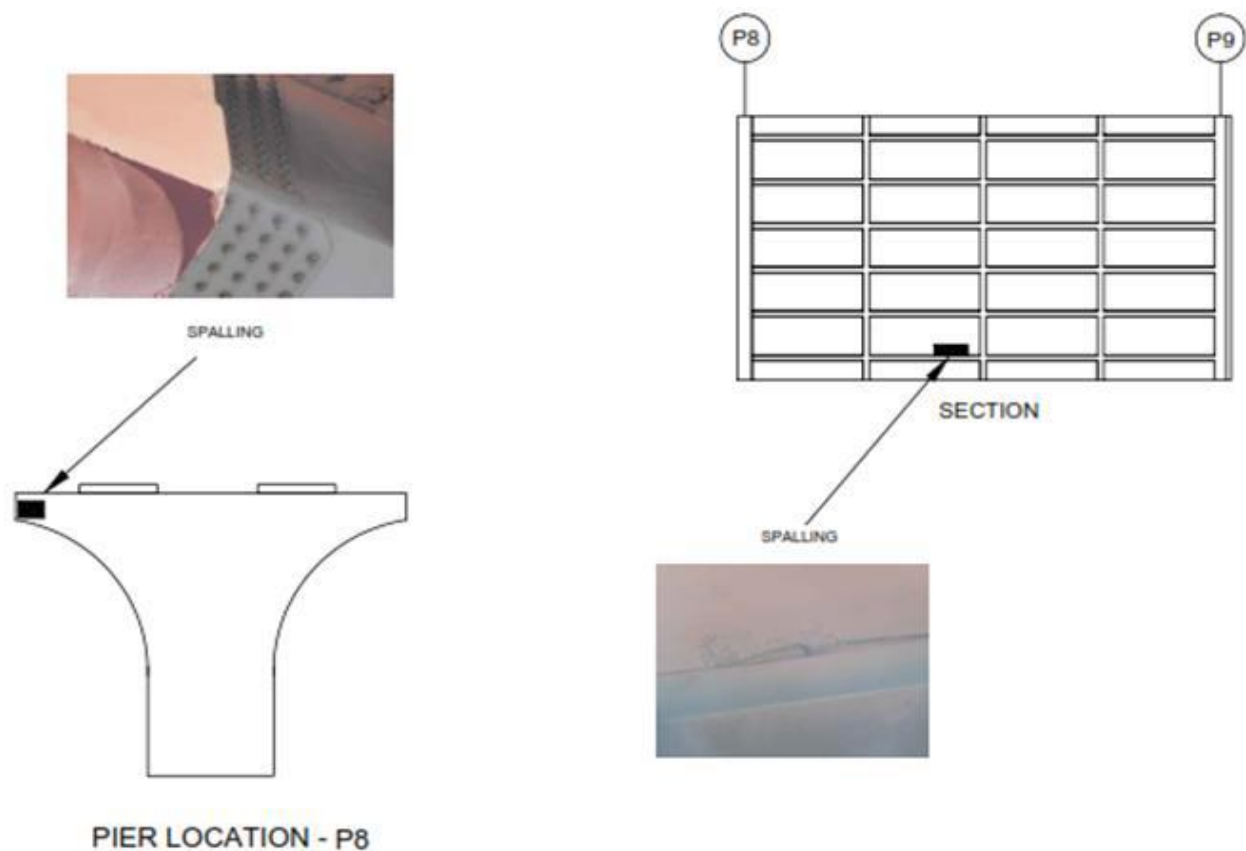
Spalling piercap and junction of panel with steel girder in P8-P9
